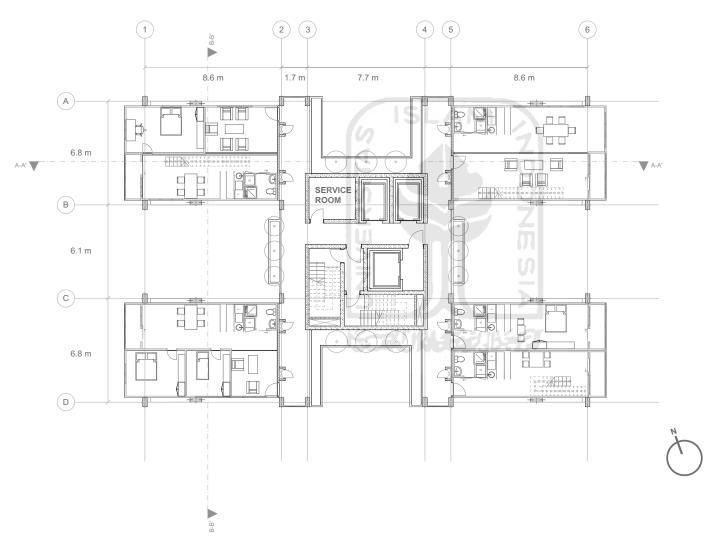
Typical floorplan of the apartment Source: Author (2021)
